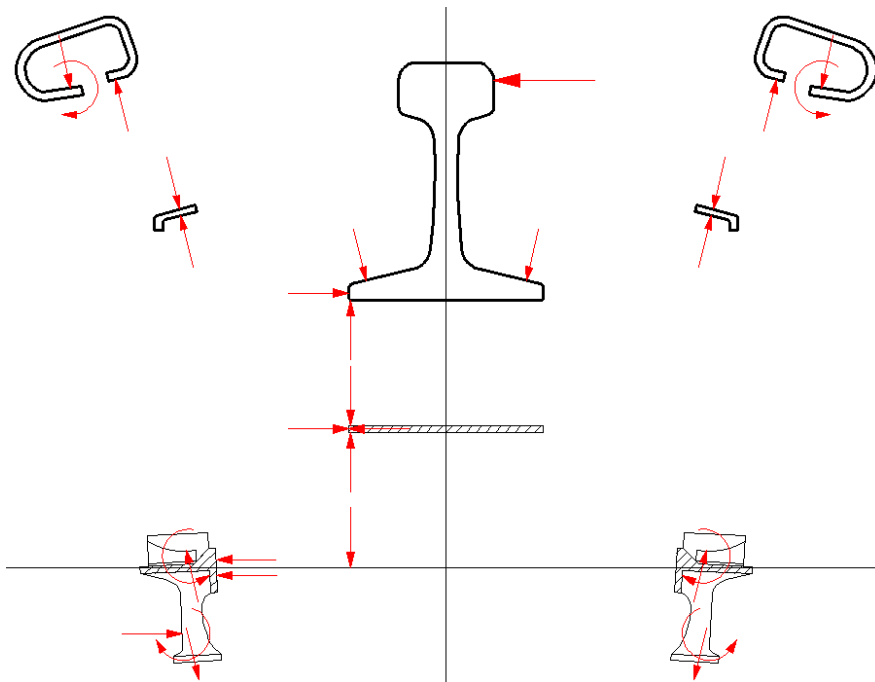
Concrete cross-tie fastening system load path map: case (c), forces due to lateral external load (rigid bodies)
